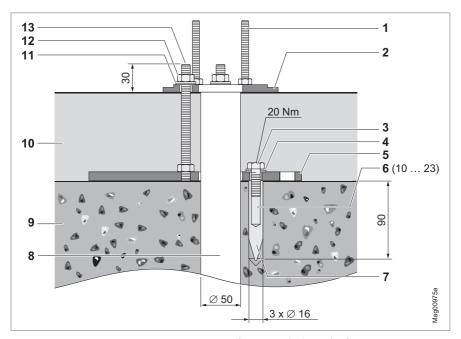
Overview mounting variant 2 (mounting the base plate)
